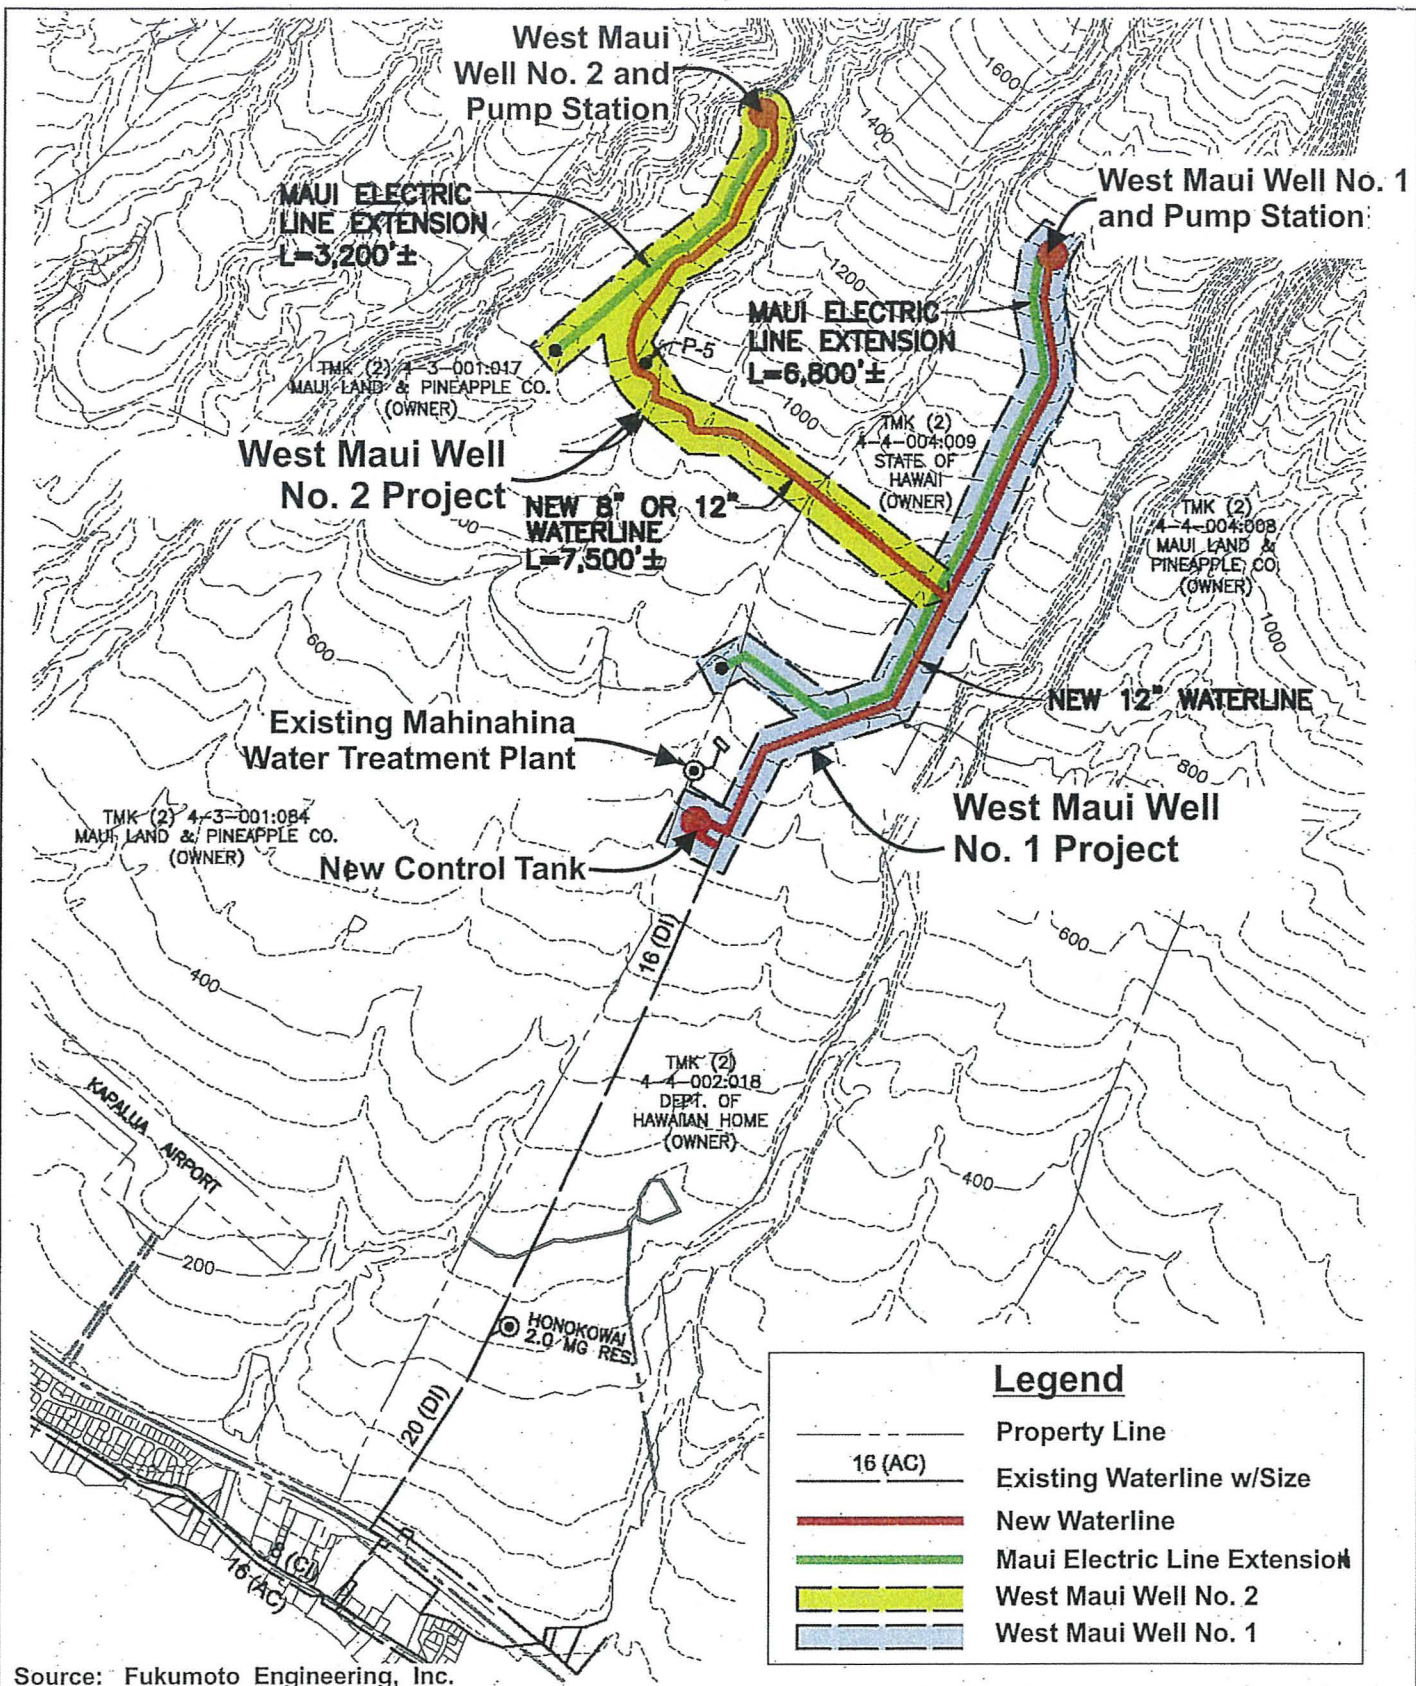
Proposed West Maui Water Source Development Project NOT TO SCALE
